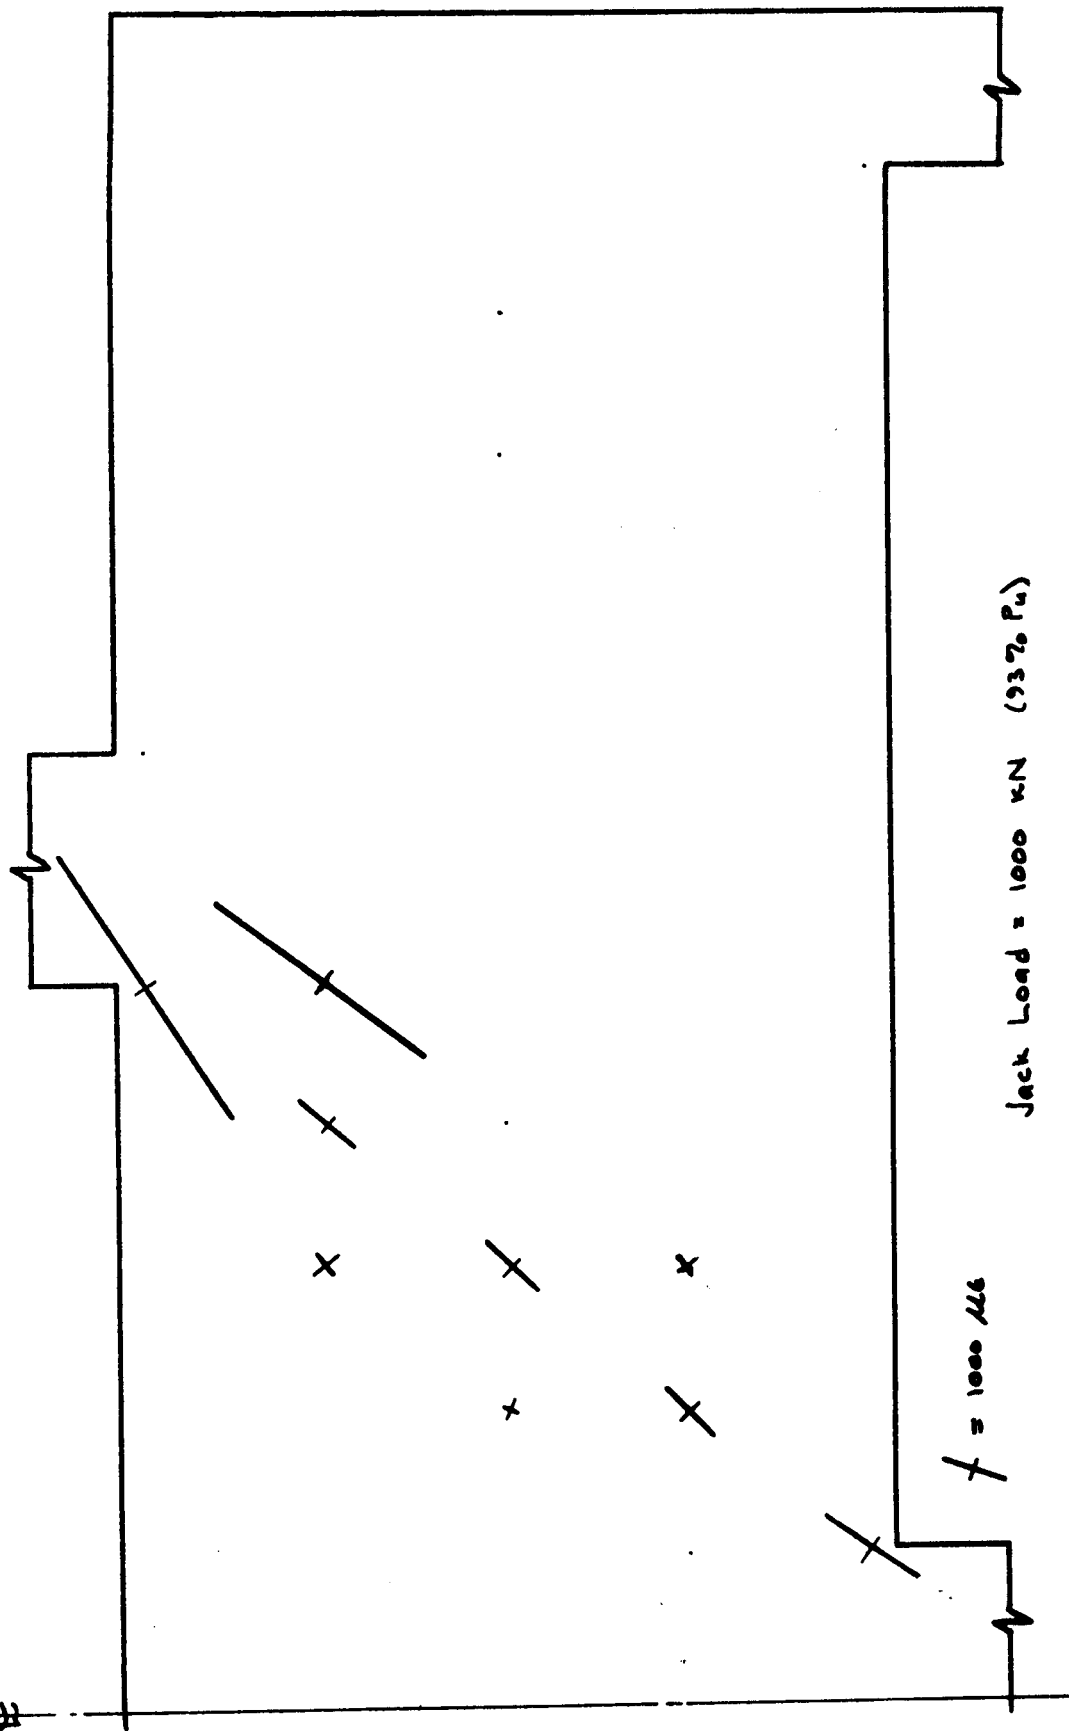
Beam 4/1.0 Concrete Compressive Strains
